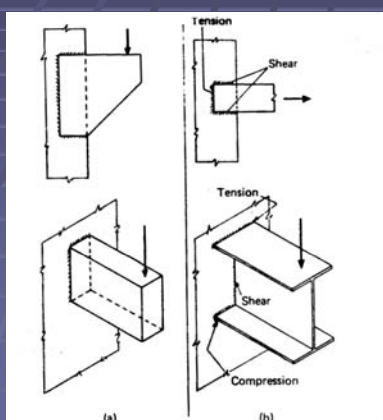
Connections where (a) simple weld design and (b) direction-dependent weld design methods are likely to be used
